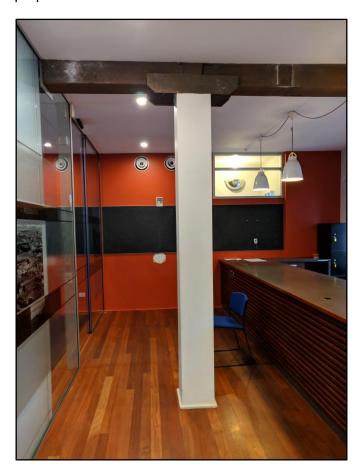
Existing internal elements including an original column and beam, being retained. Office fitout includes removal of the service counter, high window within an existing partition wall, cabinetry, and skirting containing wiring. All elements to be removed are modern elements.
